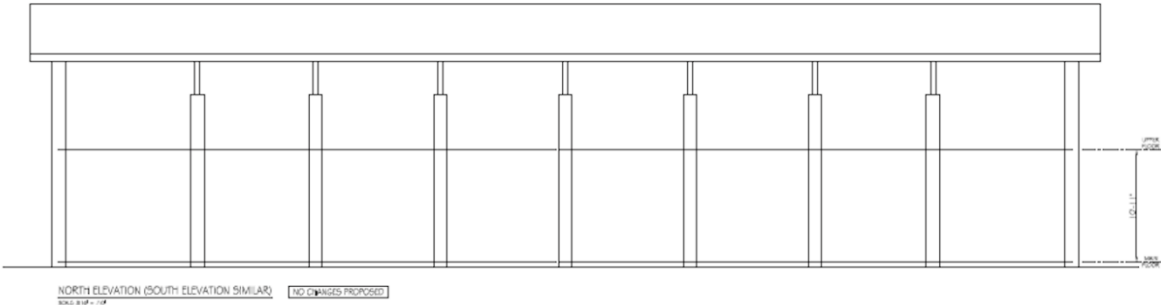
Blueprint of North Elevation side wall of Dispatch Centre building
